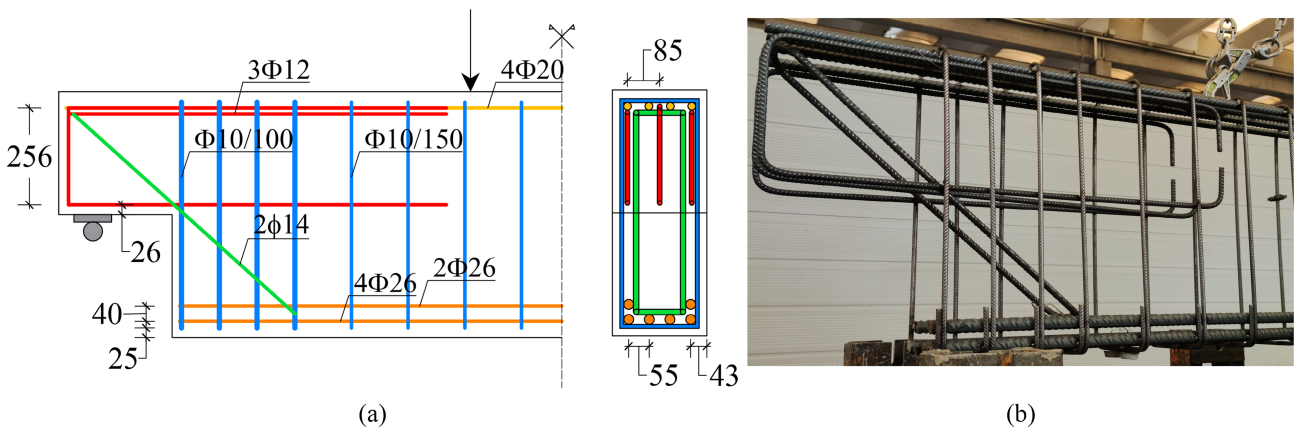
Steel reinforcement layout of beam specimens (a) and picture of the cage (b). Measures in mm.
